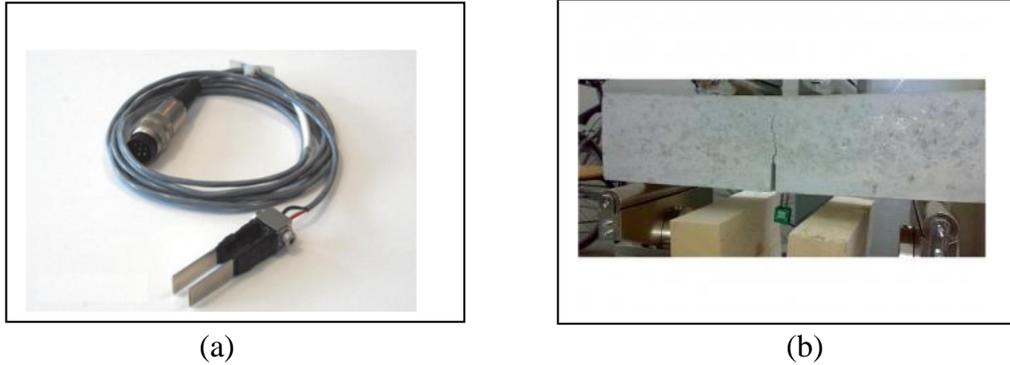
(a) Displacement transducer for measurement of crack opening; (b) The transducer mounted on the bottom of a notched concrete beam (Controls Group, n.d.)
